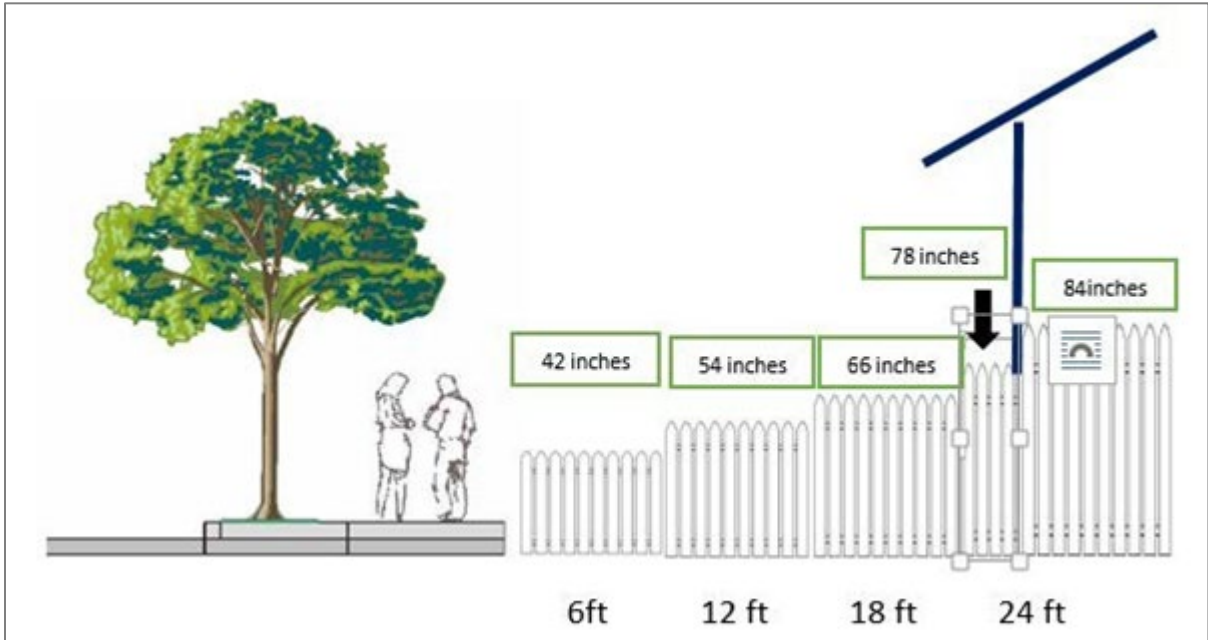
A – Stepped Fence or Wall Height Elevation View
